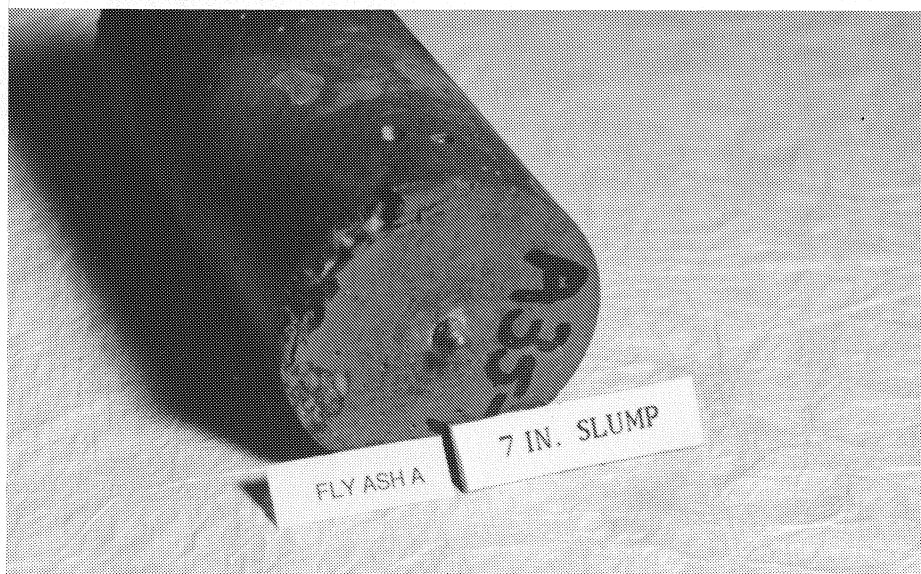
Concrete specimen containing 35% fly ash A at 56 days.
